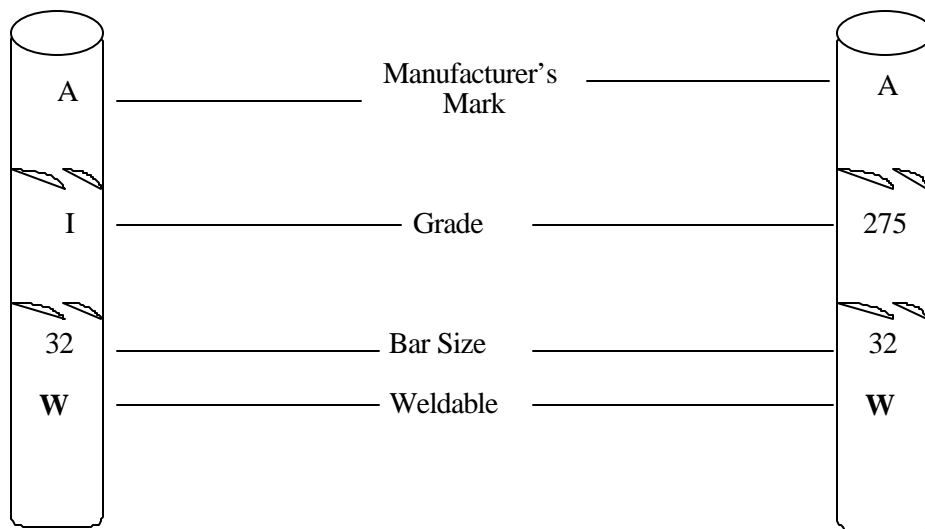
Marking for Grade 275, Size 32, Weldable Deformed Bar
